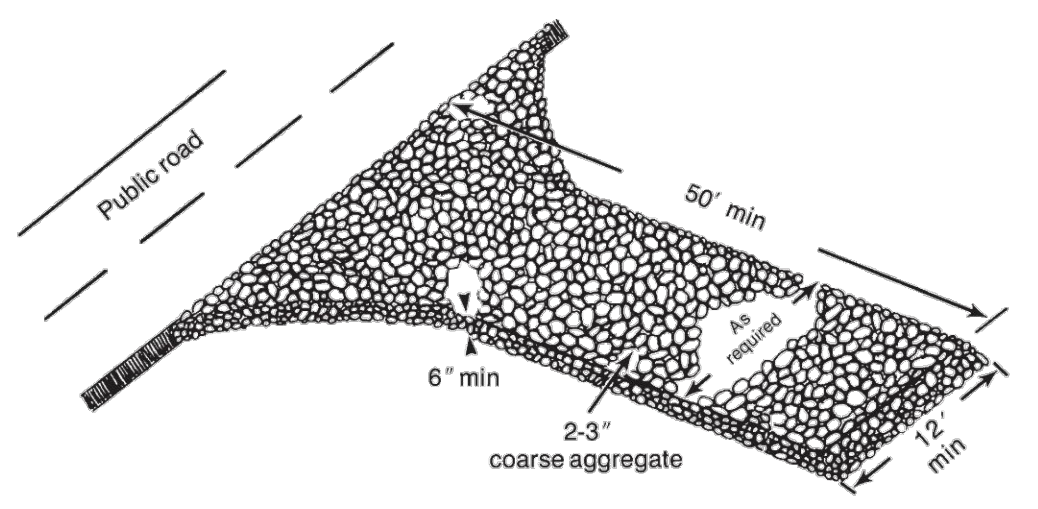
Gravel entrance/exit traps sediment from leaving the construction site (modified from Va SWCD).
